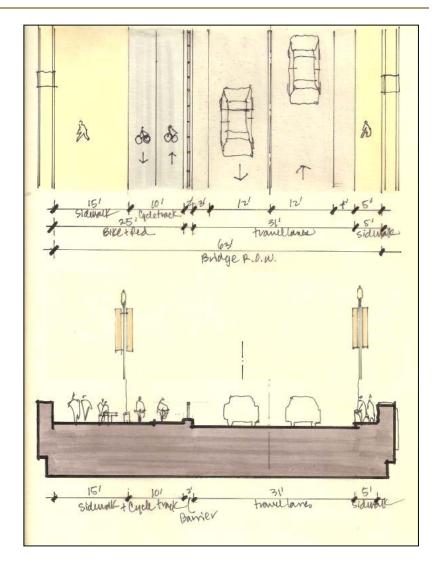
Derby-Shelton Bridge Segment Option 2 Cross Section
